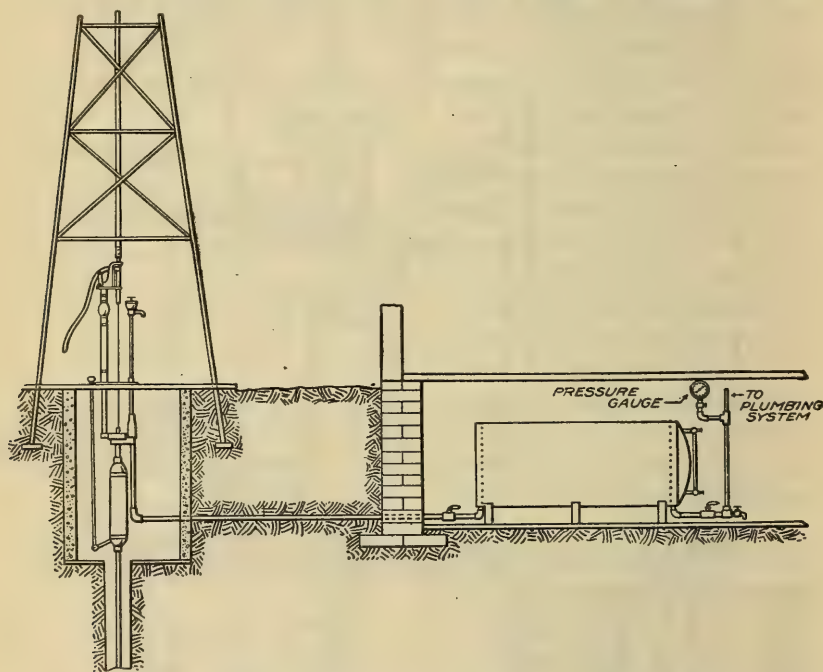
Pneumatic tank supply system with tank in basement supplied by windmill deep-well pumping outfit.
